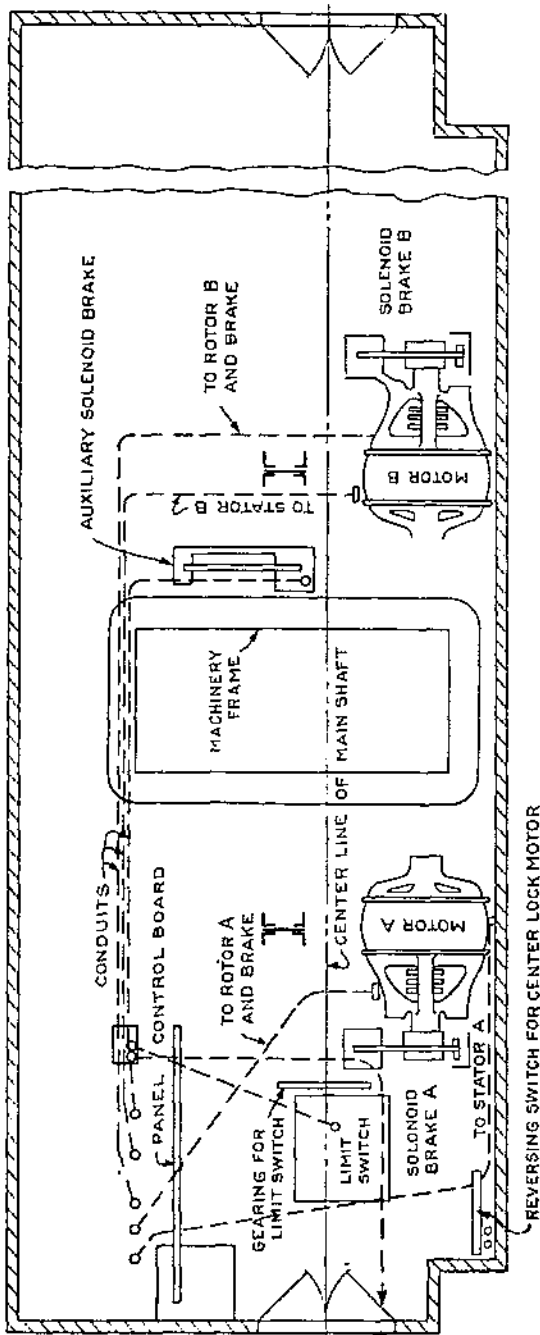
Plan view of machinery room floor showing location of conduits, etc.
